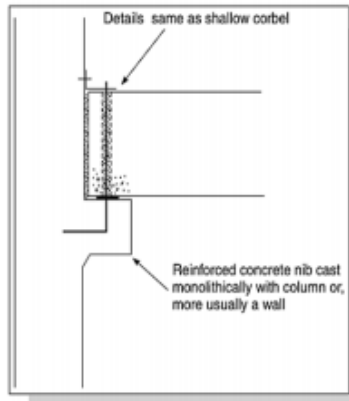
Nib beam-to-column (or wall) visible connection.
